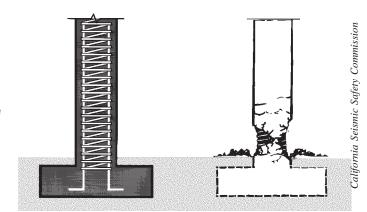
The addition of more confining steel (c) keeps the vertical reinforcing bars from buckling and the concrete from shifting so that the building continues to be fully supported (d) even it if is damaged in an earthquake.
